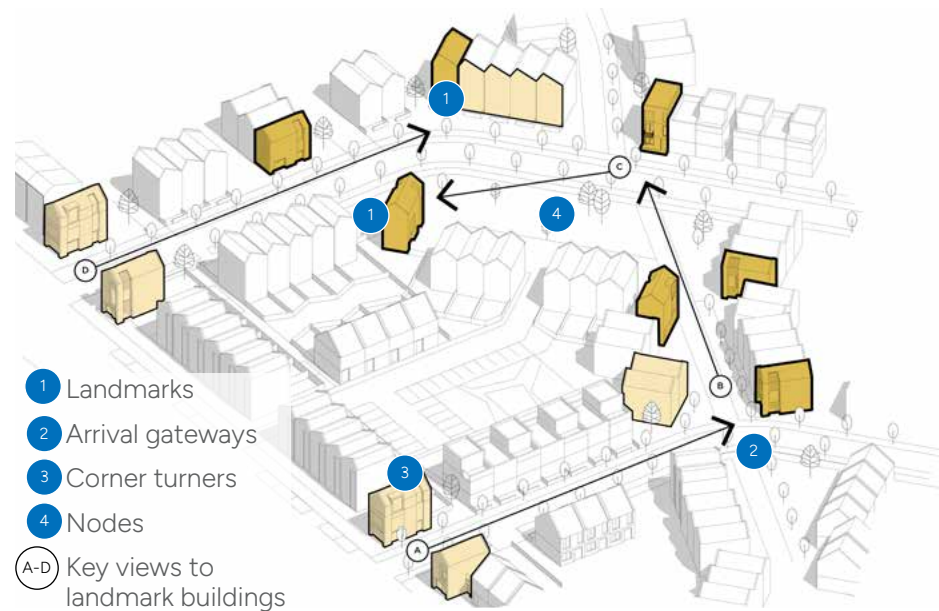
Illustrations demonstrate key buildings defining corners and terminating views
